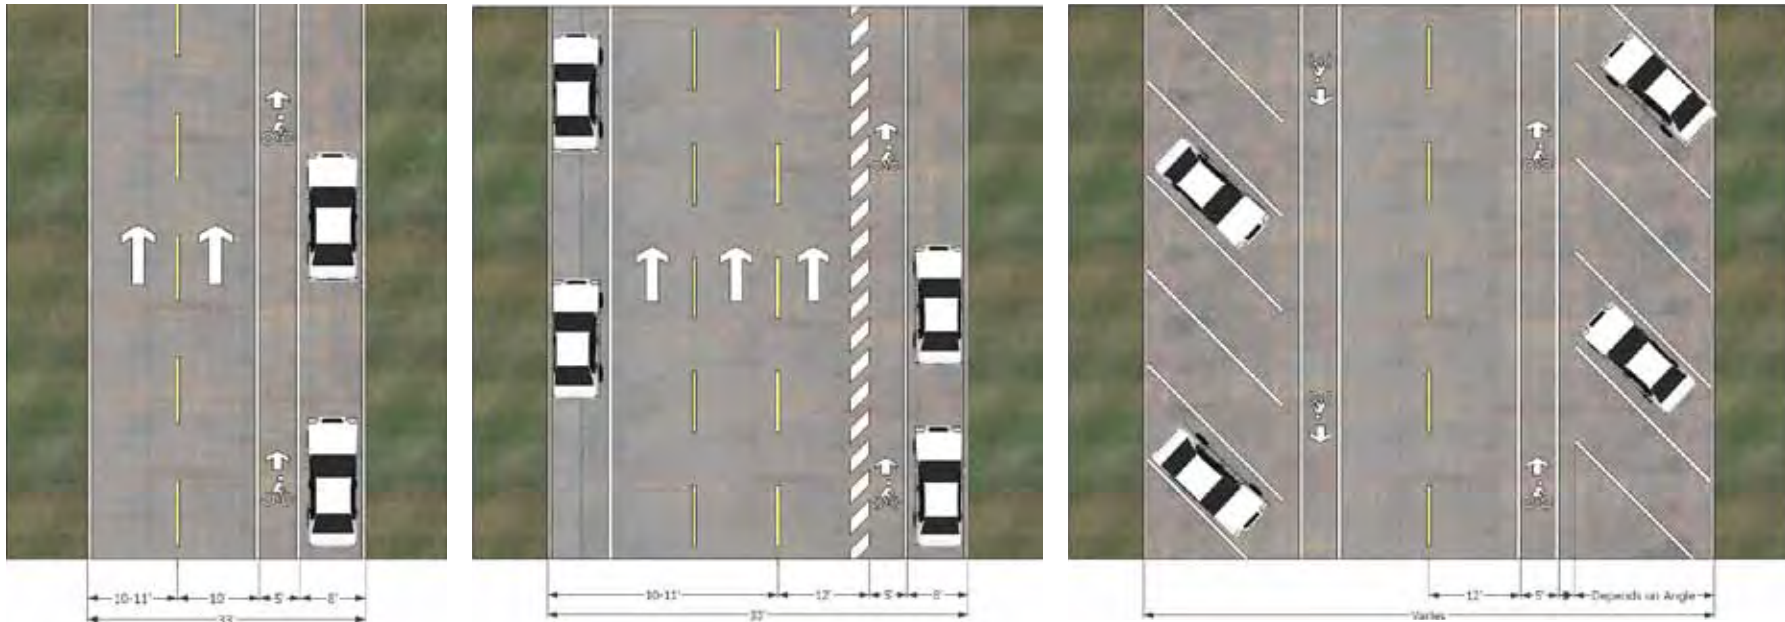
Design Dimensions for Bike Lanes on One-Way Streets and with Diagonal Parking
